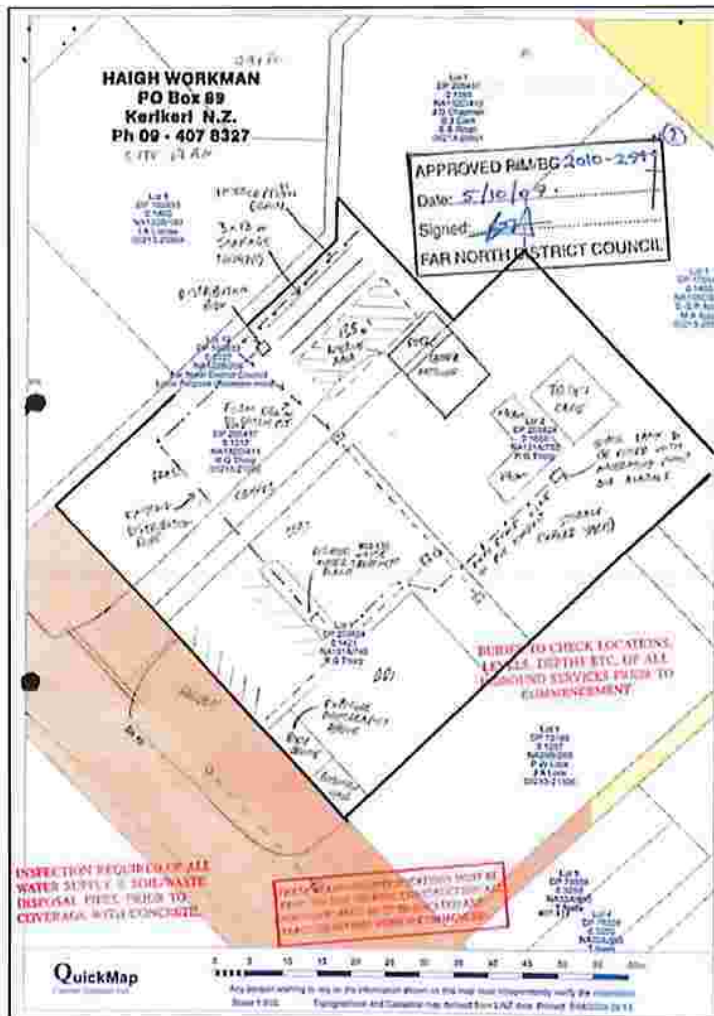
Stamped approved plan for existing wastewater system (BC 2010-294-0)
